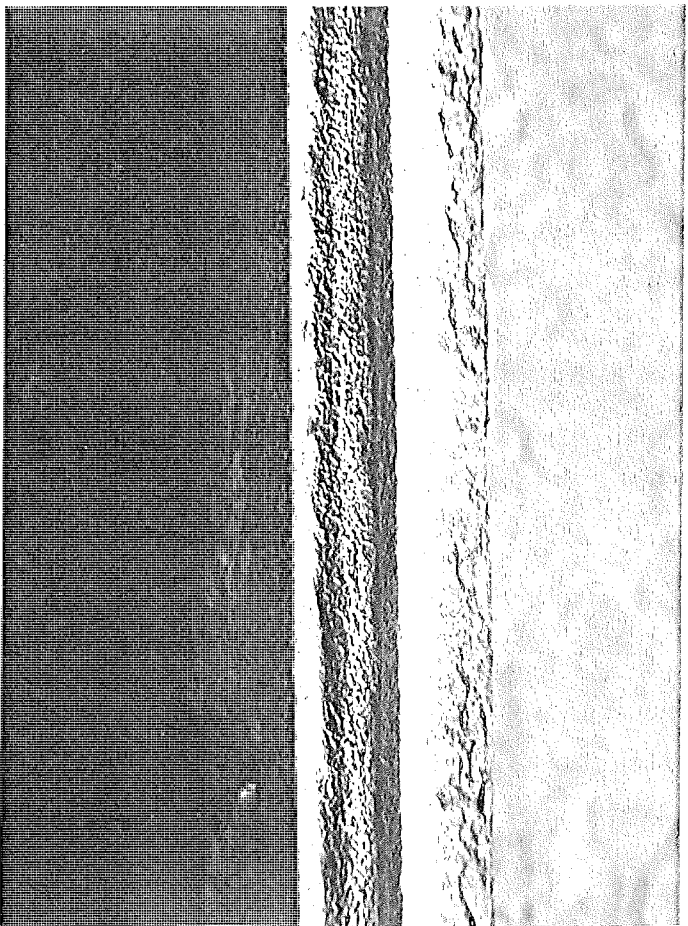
Wire-brushed fillet weld on a beam cover plate showing pitting after 14 years of service.
